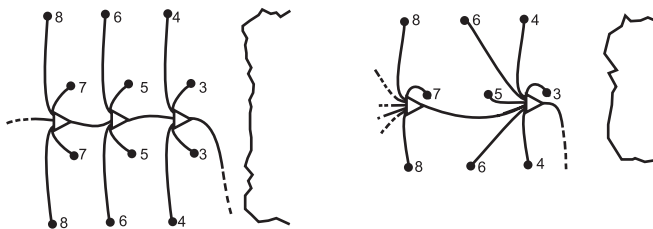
16. Non-electric system connected to connecting piece in trench blasting.
